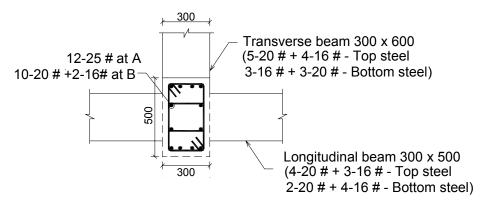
Reinforcement details of longitudinal and transverse beam
